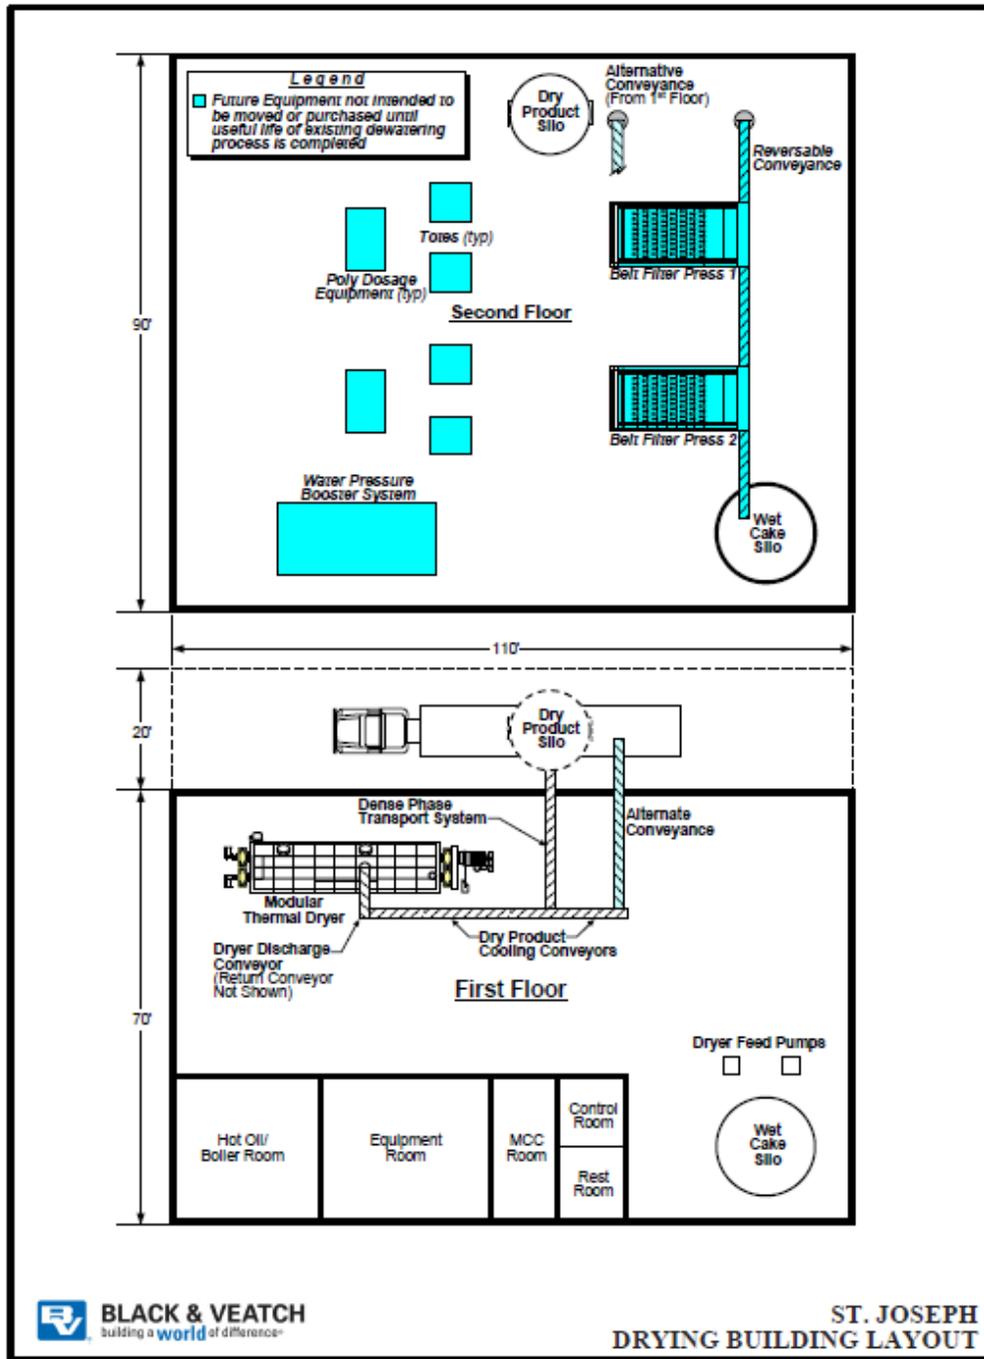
Proposed Thermal Drying and Dewatering Building Layout
